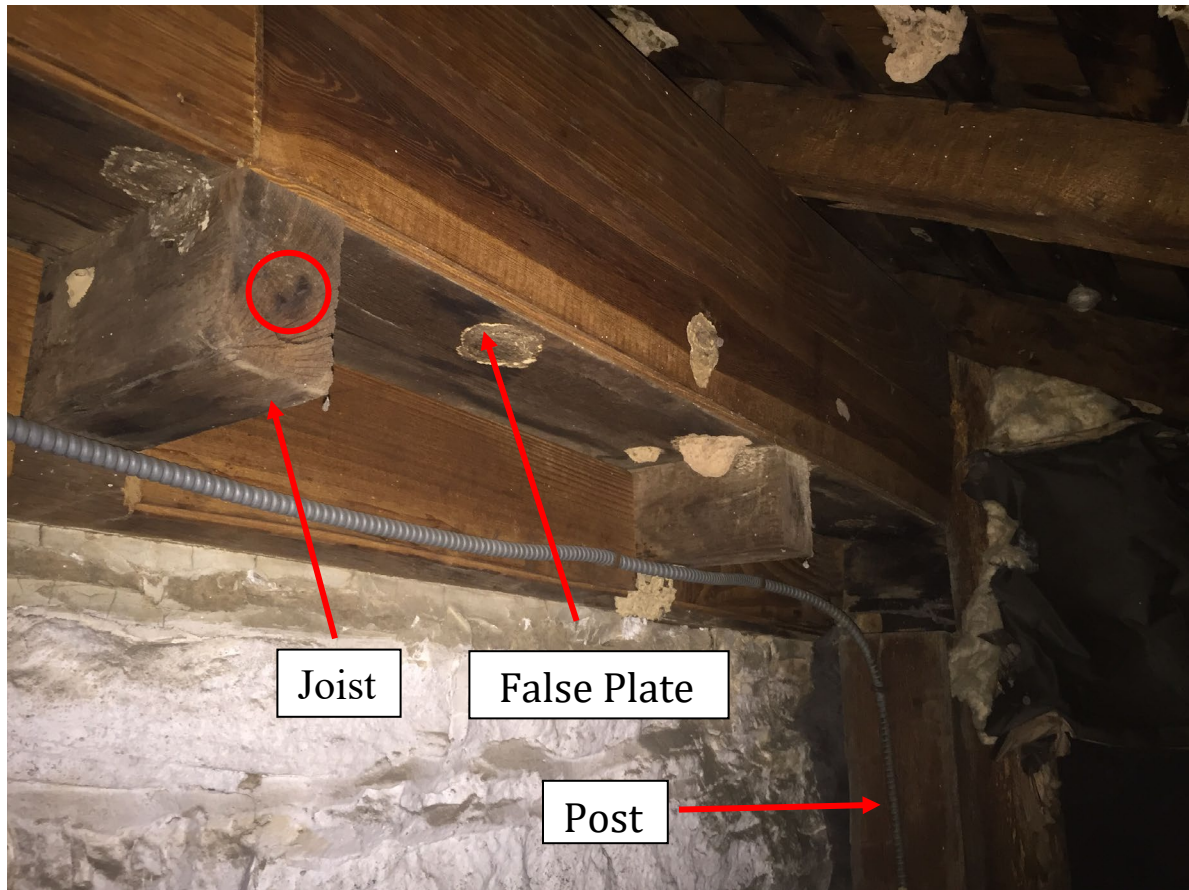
Remnants of trapped north eave of Duplex 1, within attic of addition (2018): joists (hewn and pitsawn) and false plate (pitsawn); rectangular holes for nails (circled in red) to attach fascia and soffit (removed); wrought nail with spade point observed *in situ* to attach rafter to false plate. Corner posts (hewn) to support frame of addition, rafters and skip sheathing boards (sashsawn), with cut nails.
